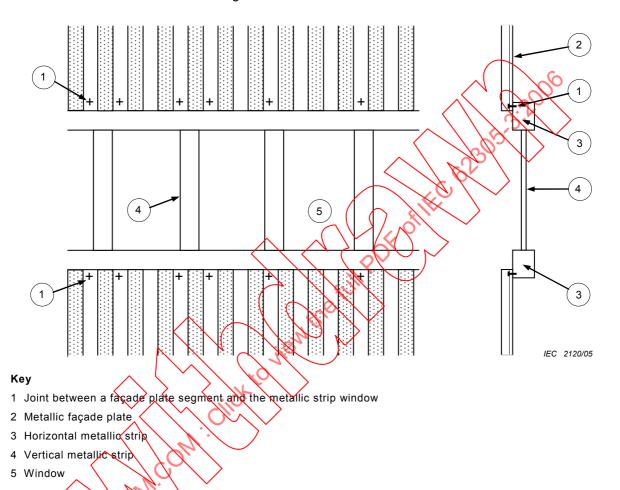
Connection of the continuous strip windows to a metal façade covering
